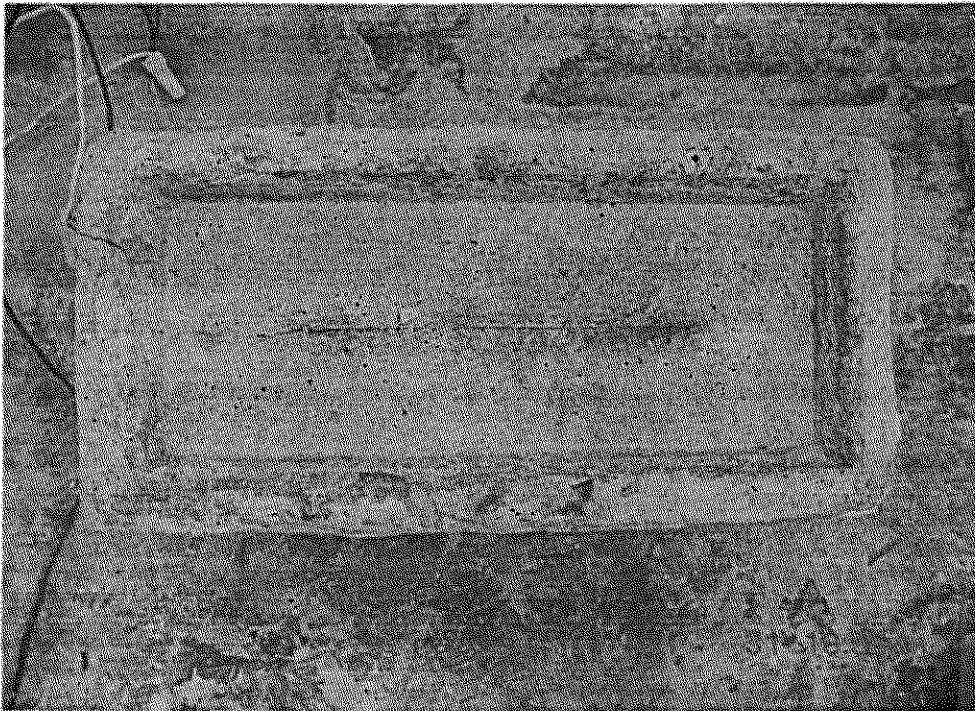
Cracked Beam test: w/c=0.45, conventional steel, normalized, rheocrete, 6.04 m ion NaCl, specimen #1
